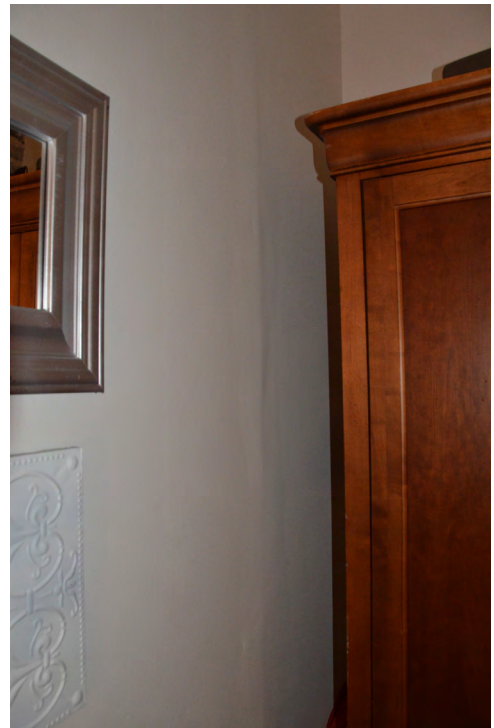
Deformation and Settlement of the Wood Flooring.
